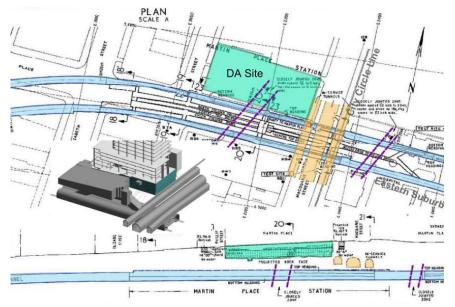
Plan showing DA site and adjacent rail infrastructure.
